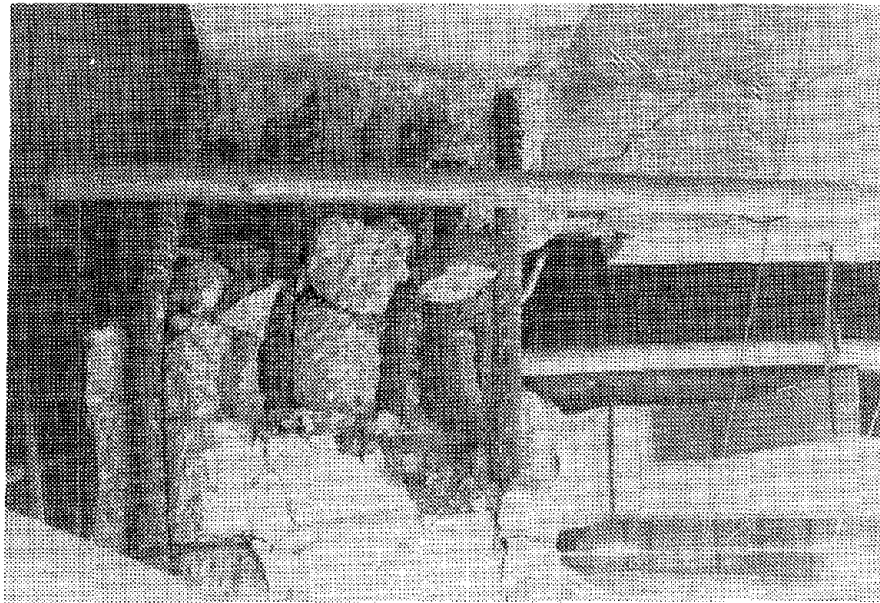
SHEAR FAILURE AT TOP OF GROUND STORY COLUMN M-29 DUE TO TERMINATION OF SPIRALS BELOW LOWEST MEMBER FRAMING INTO COLUMN
